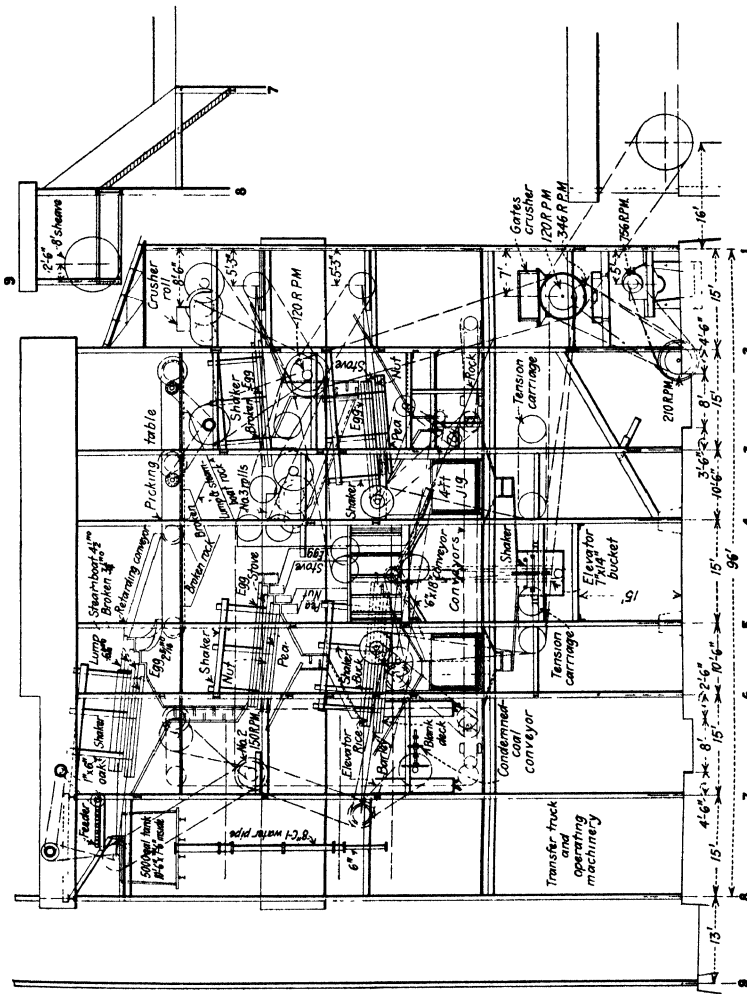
ARRANGEMENT OF MACHINERY IN FRANKLIN BREAKER OF LEHIGH VALLEY COAL CO.; LOADING POCKETS ARE SIMILAR TO THOSE SHOWN IN FIG. 53.
